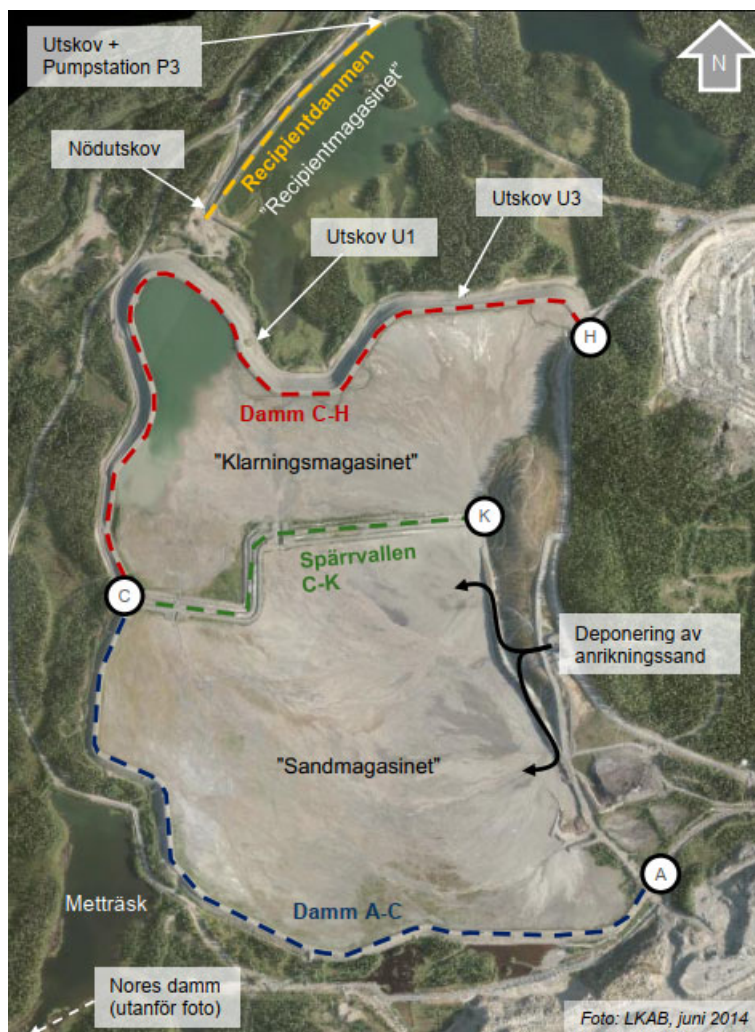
Svappavaara Tailing Storage Facility and recipient dam (EW fov 1.5km).
